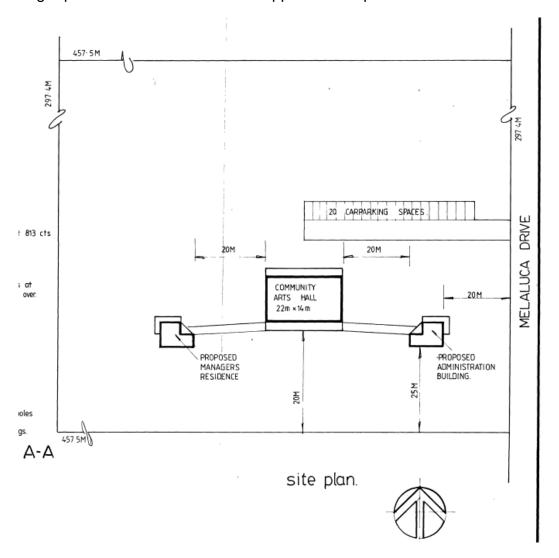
Extract of approved Site Plan for consent 5.1990.49.1
